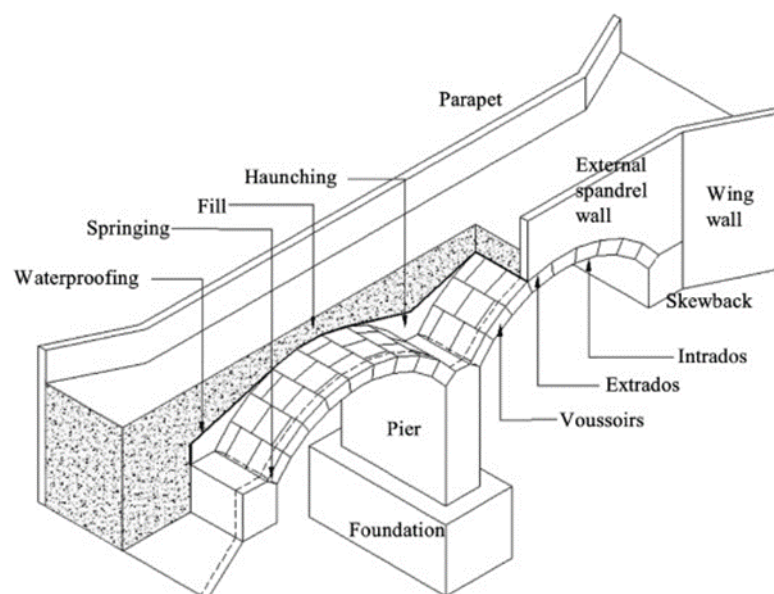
Typical Structure of Masonry Arch Bridge (Sarhosis et al., 2016)
